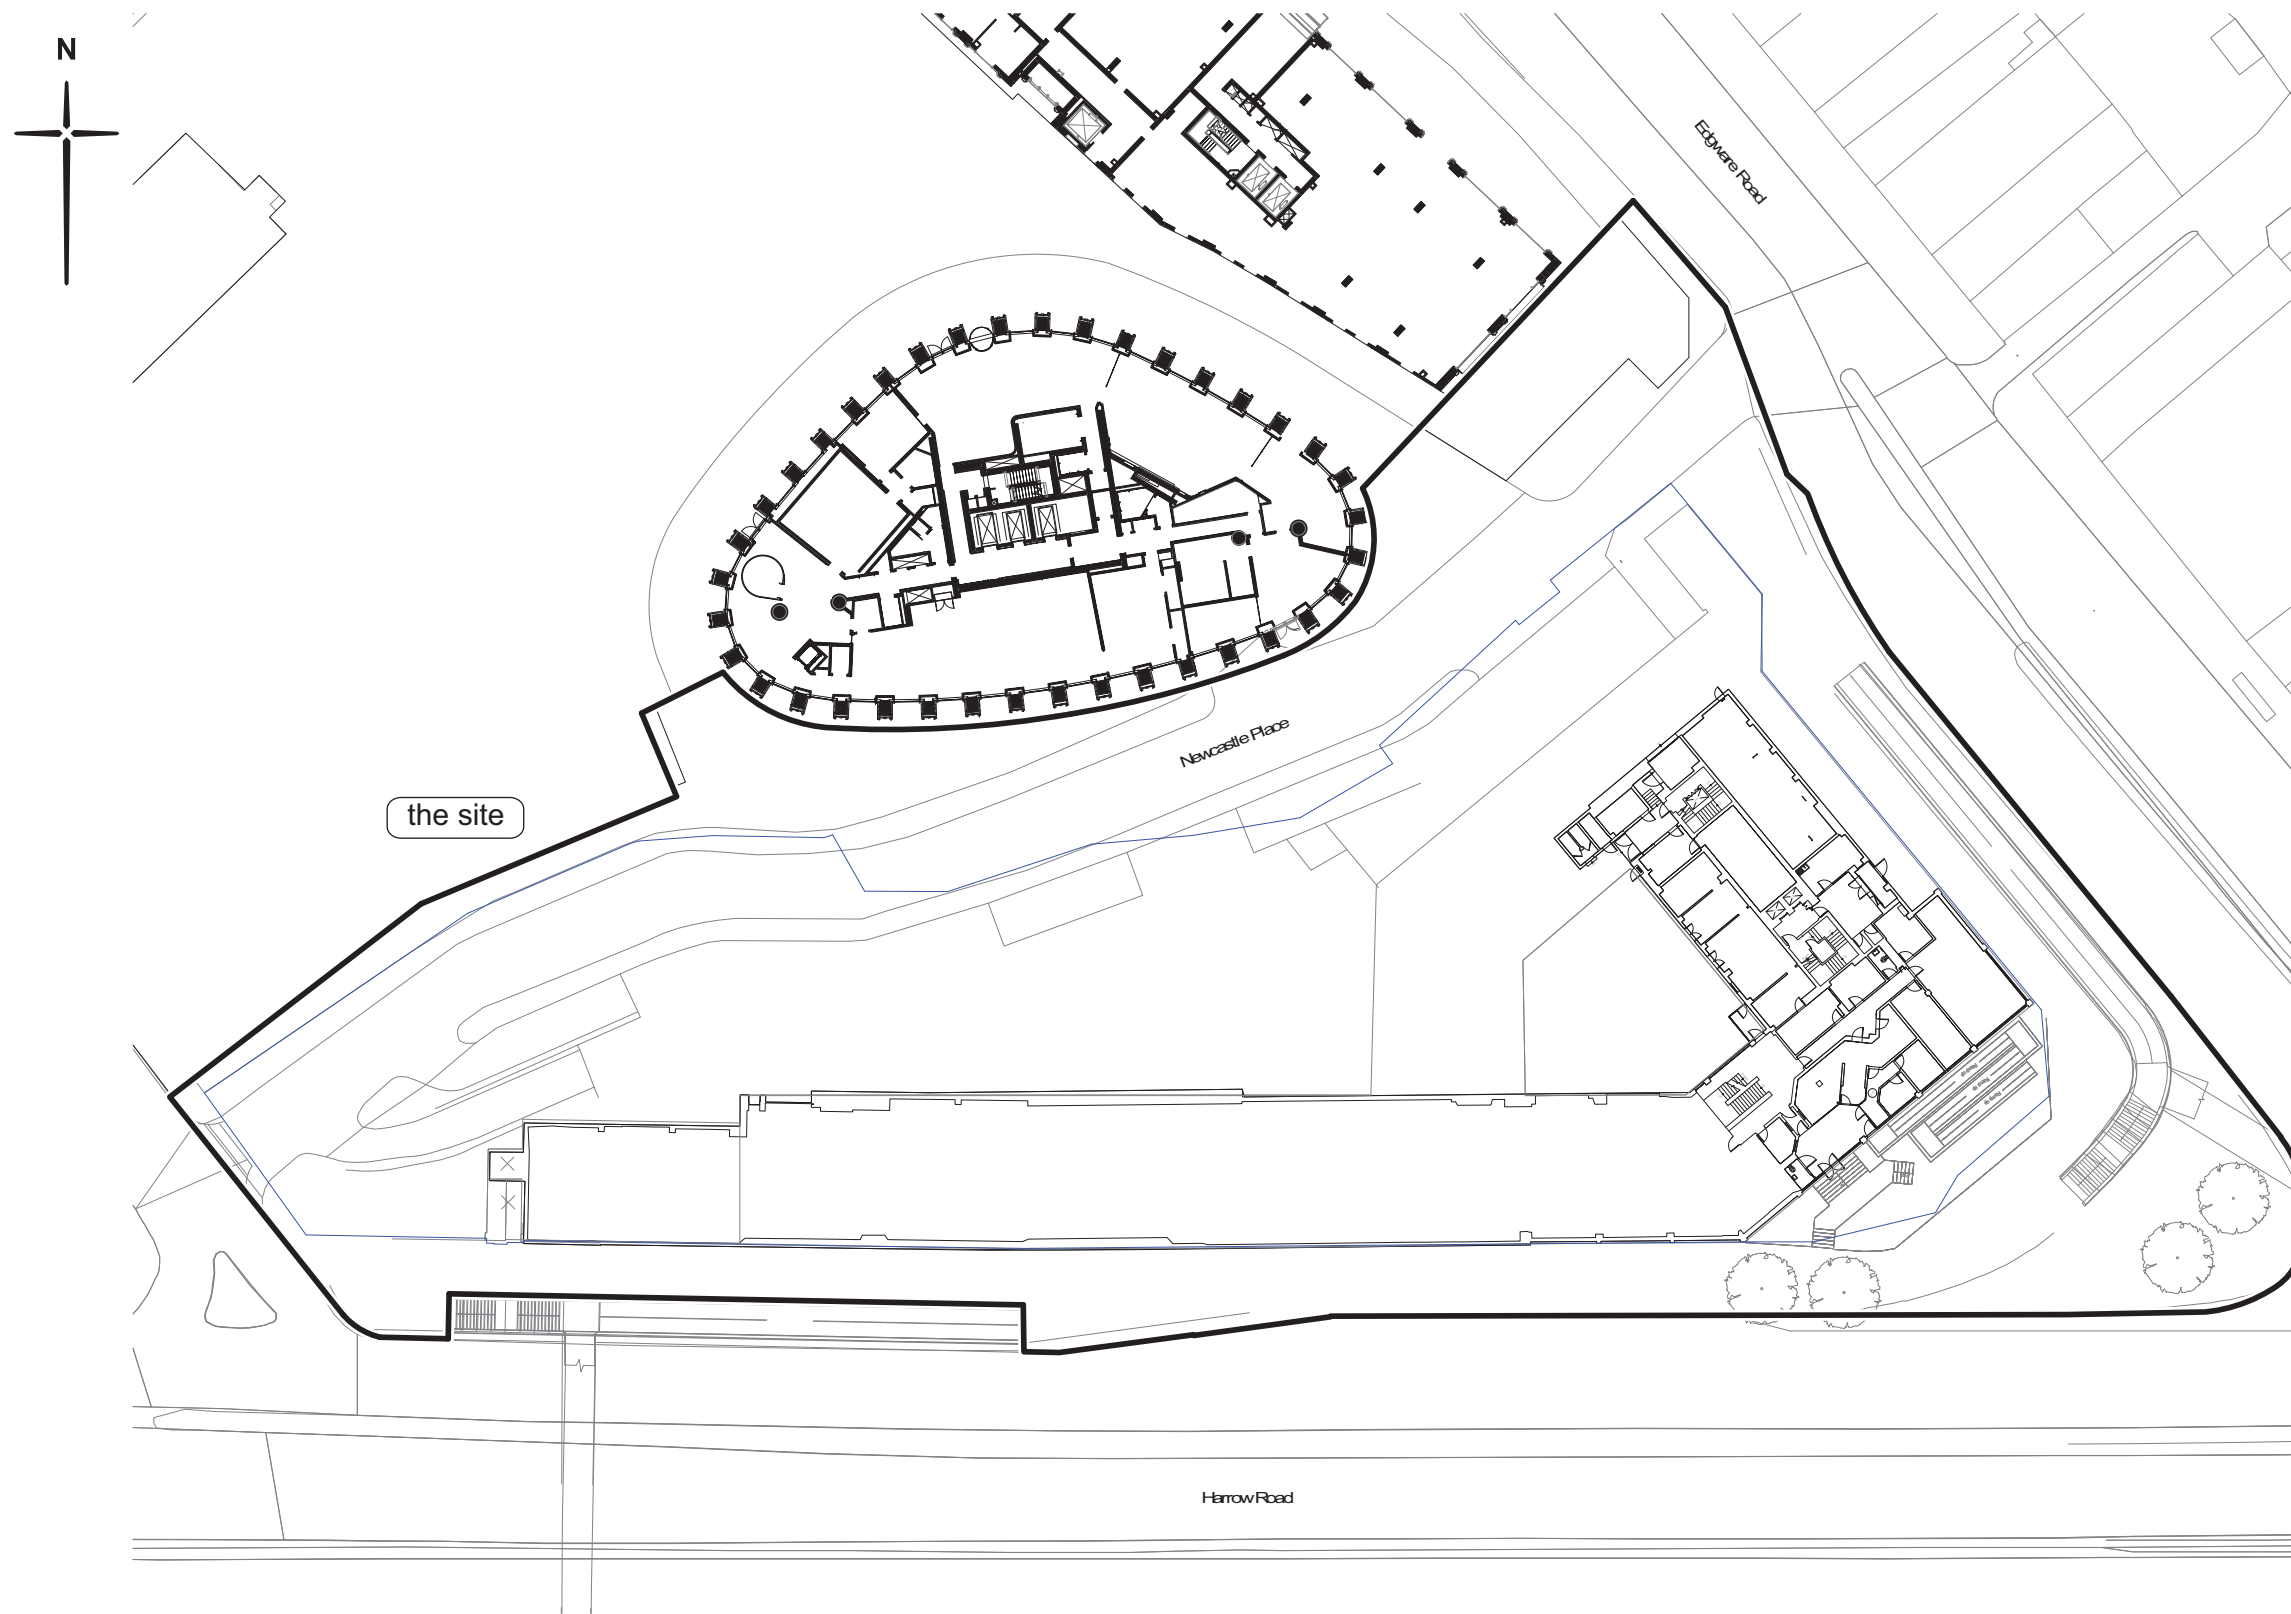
Existing ground floor plan (Squire & Partners; job. 15044; dwg. 15044-SQP-ZZ-00-DP-A-PL01003; rev. P1; 2020)
